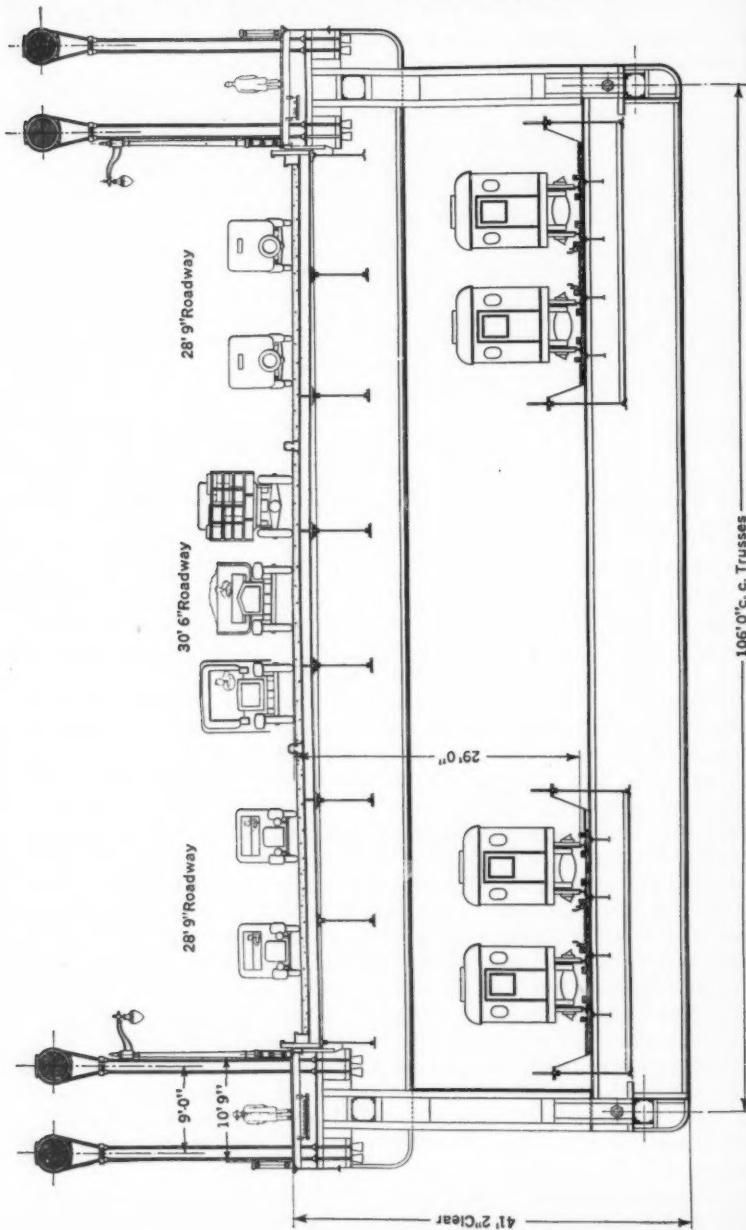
TYPICAL CROSS-SECTION OF DOUBLE-DECK FLOOR, GEORGE WASHINGTON BRIDGE.
